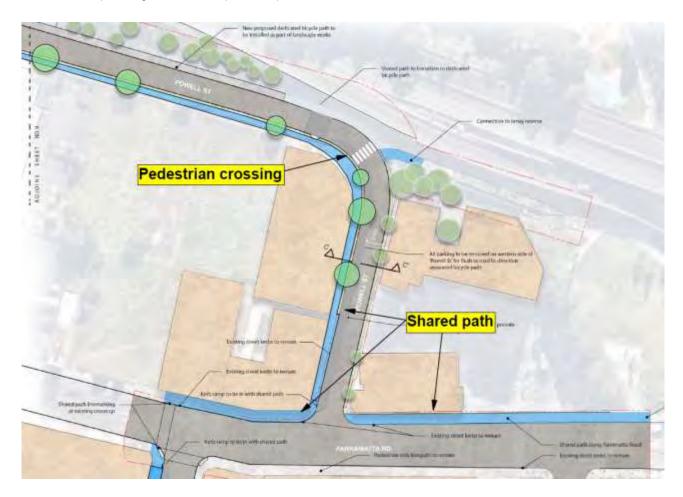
Section 5 of the HMaPP between Parramatta Road and Powell Street
